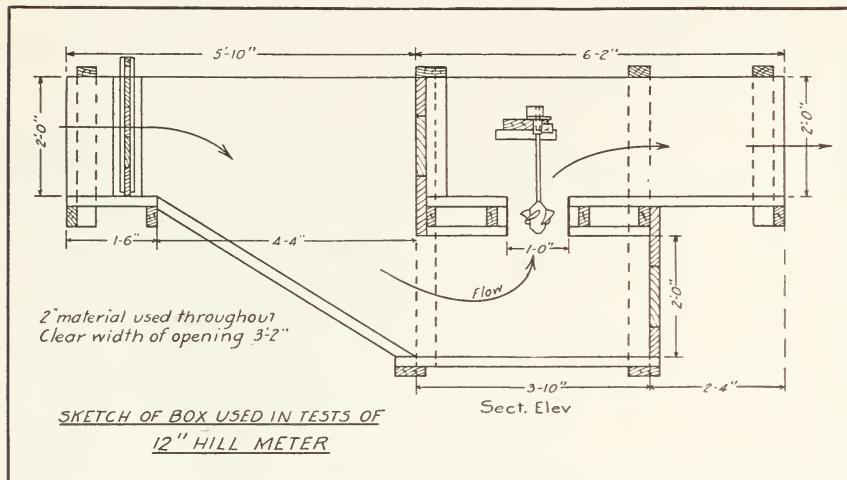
Sectional elevation of installation of 12-inch Hill meter
